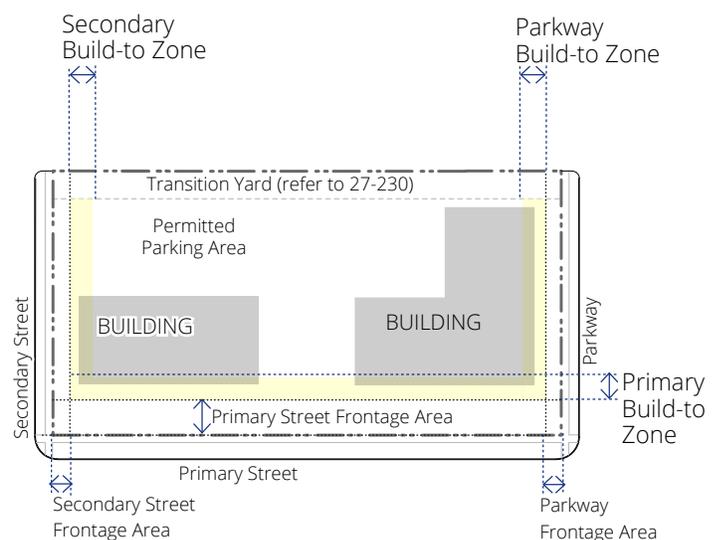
Corner and Build-to Zones on Different Street Types
